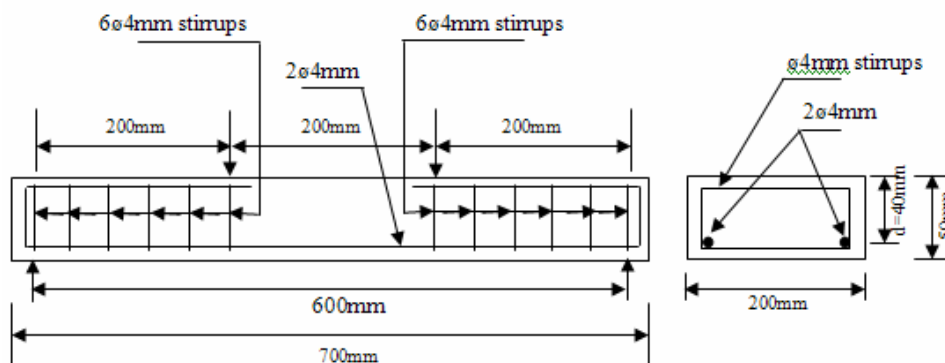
Dimensions and loading arrangement of UHPC thin beam (B2) [12].
